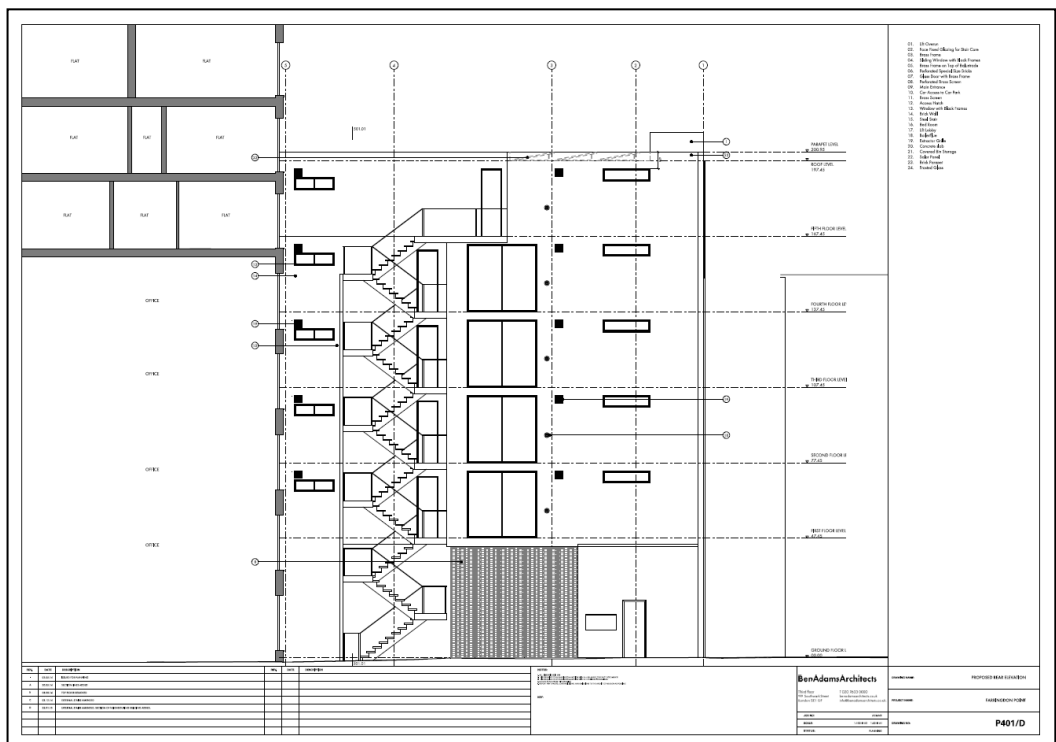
Proposed Rear Elevation (©Ben Adams Architects)
